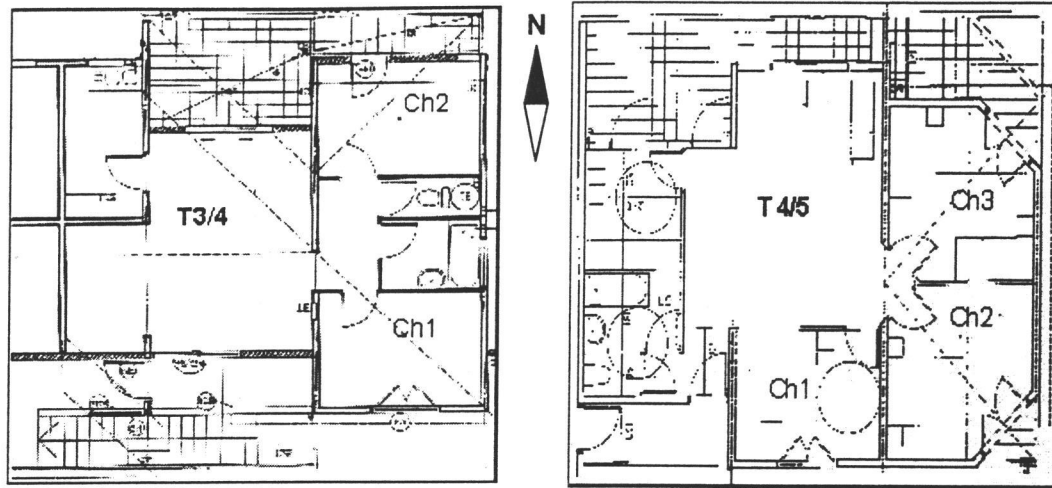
Plan view of the instrumented dwellings (left side : C1T3 and C2T3, right side T4RdCand T4R1)
